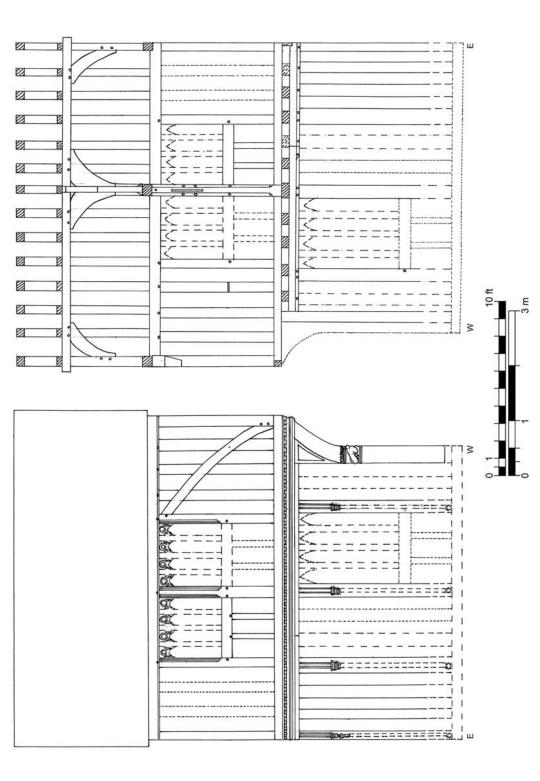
(left) North (side) elevation and (right) E to W section of Part A high end cross-wing, The Stockwell Arms, 18 West Stockwell Street (corpus no. 101). Drawn by Richard Shackle
